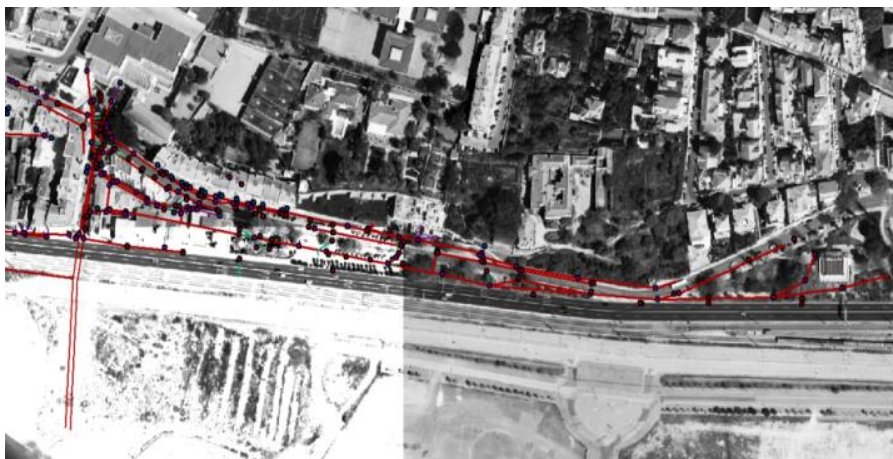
Stormwater drainage system of the Dafundo downtown area
